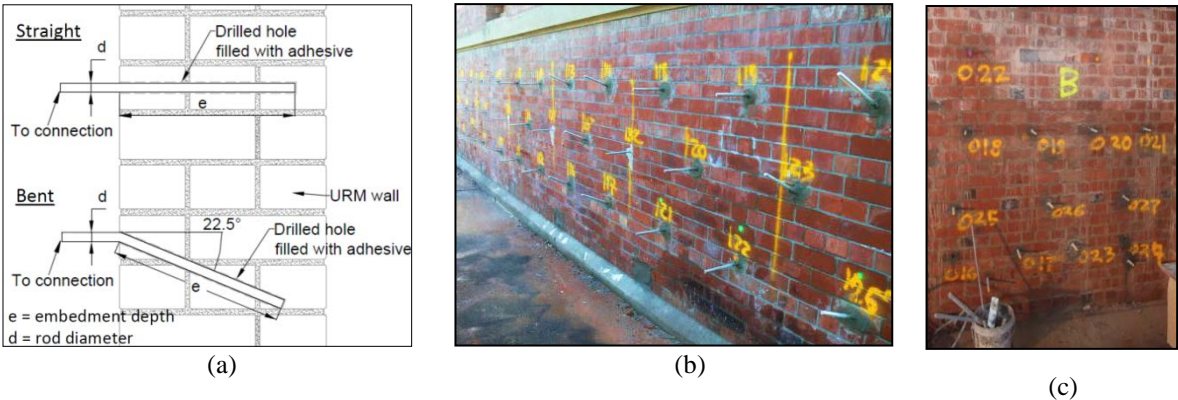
Testing arrangement of adhesive anchors: a) Test parameters; b) Wards Brewery Building 2, Christchurch; c) Phoenix Wine and Spirits Building, Whanganui.
